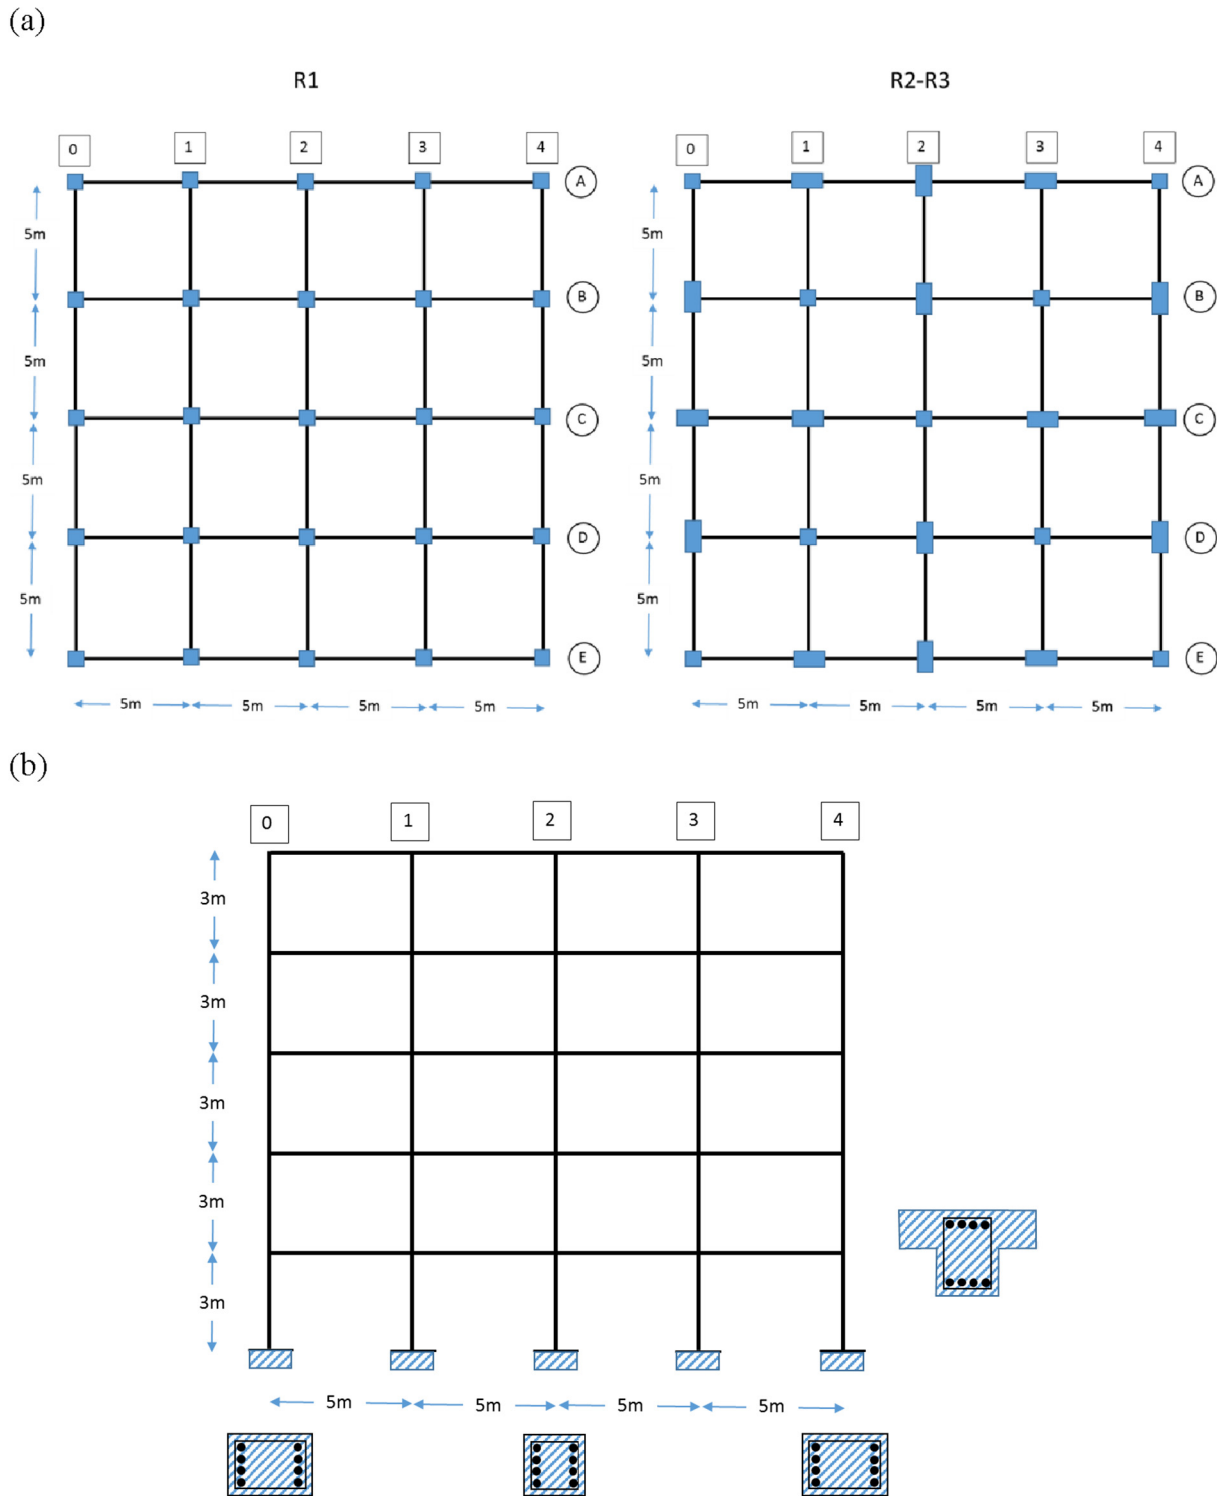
Plan and elevation view of the example building. (a) Plan view, (b) Elevation view, frame C.
